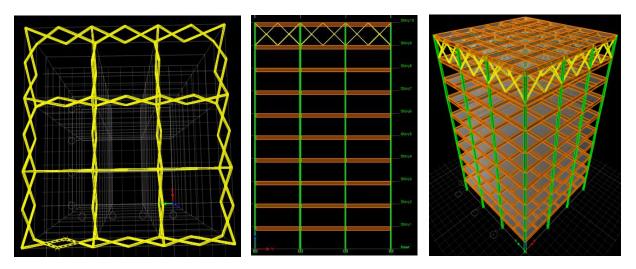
(a): Typical Floor and Beam Arrangement Fig. 5 (b): Elevation
